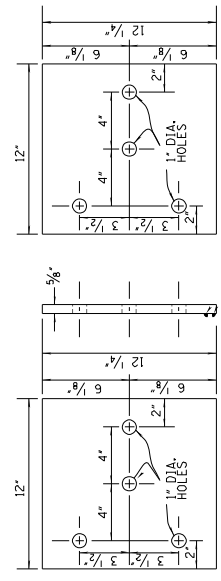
DETAILS SHOWING PLACEMENT OF HOLES FOR INTERMEDIATE BRACKET (VIEWED FROM ROADWAY)
